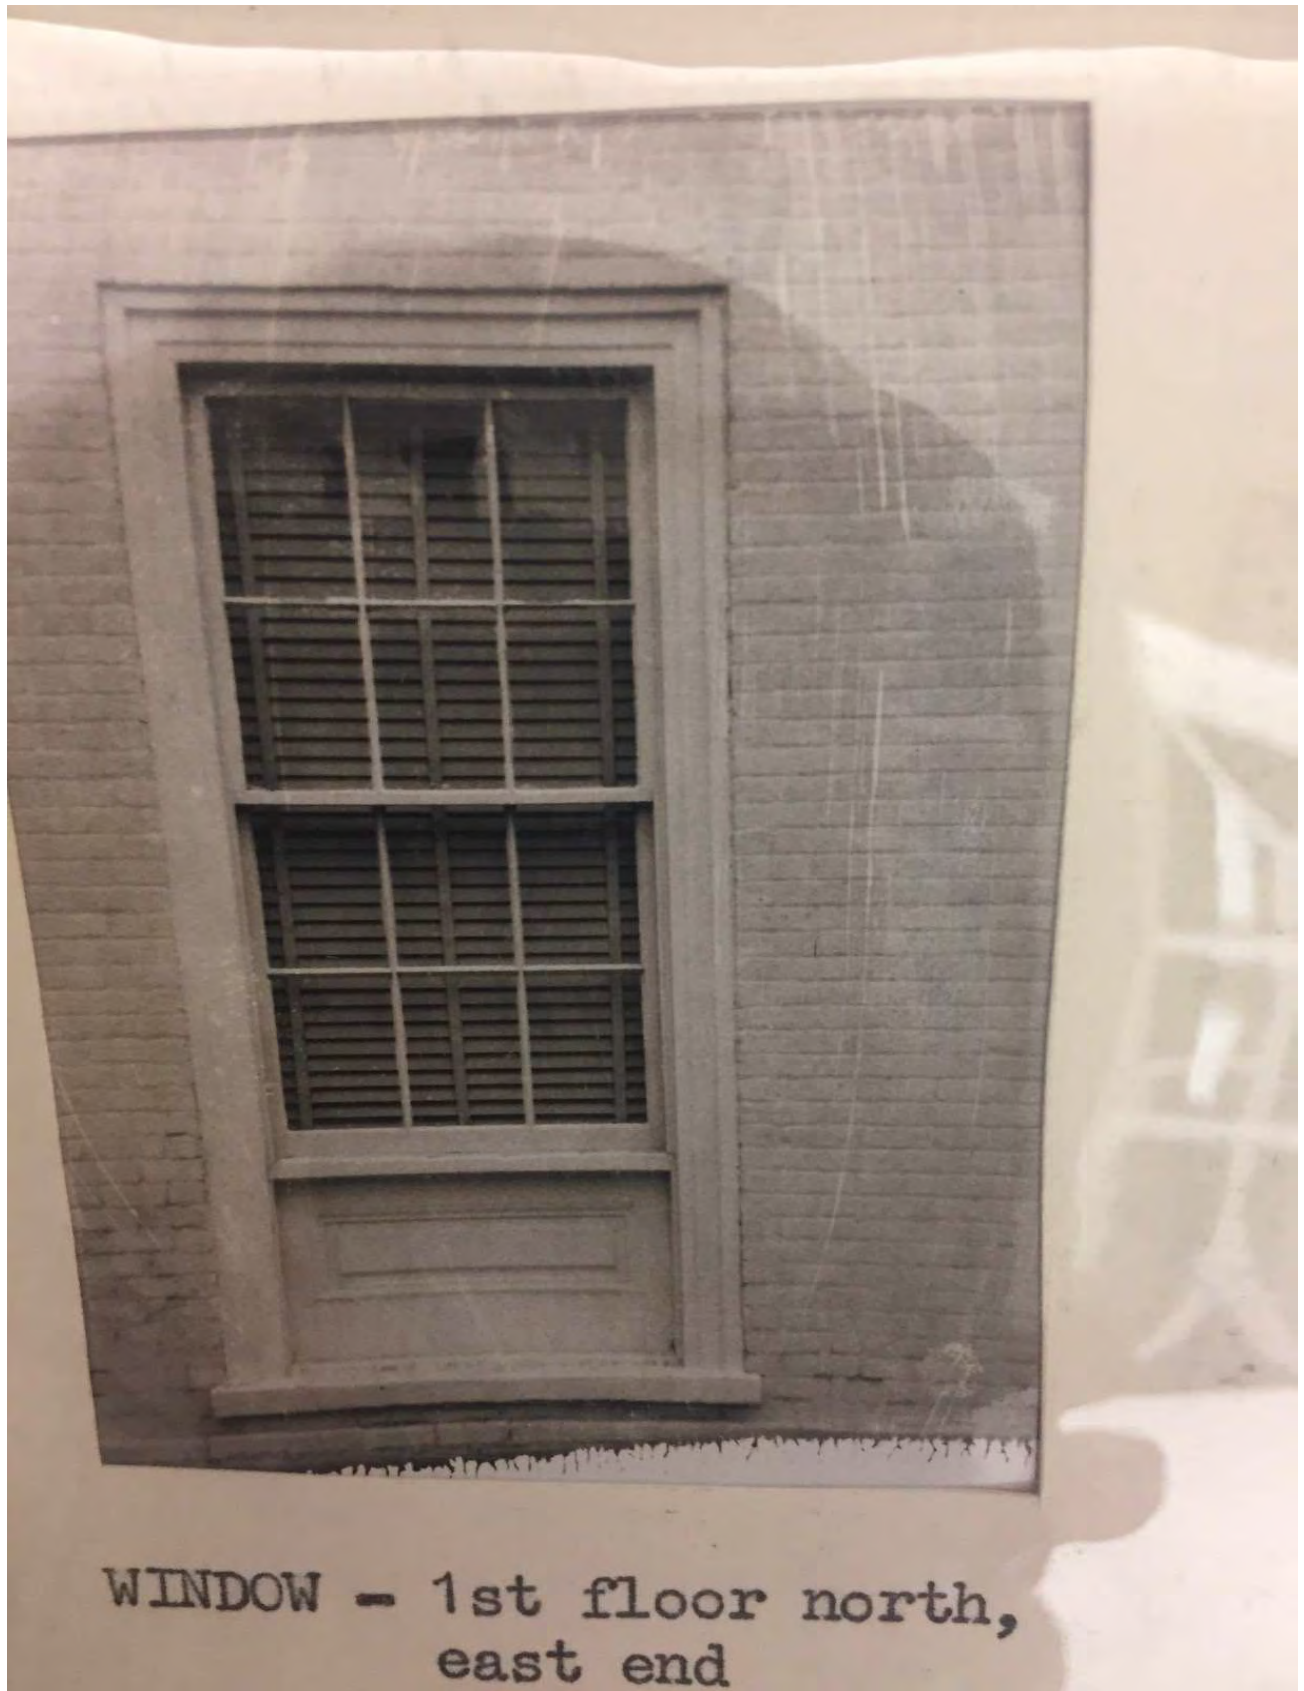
HISTORIC PHOTO OF 6TH STREET SIDE OF BUILDING HAVING BEEN PAINTED WHITE
